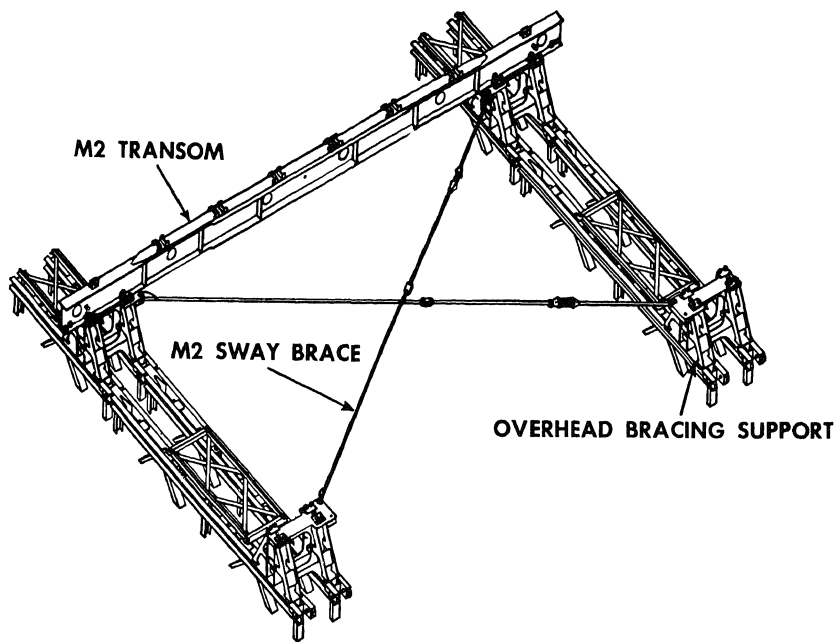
Location of bridge parts in overhead bracing of double-triple bridge.
